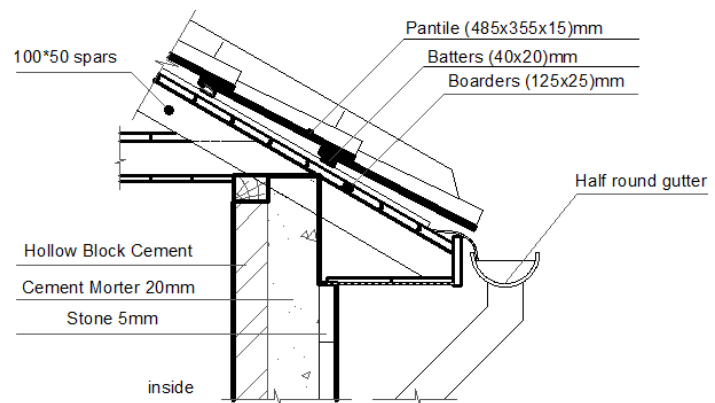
Section in pitched roof (Hanan Ahmad, 2016).
